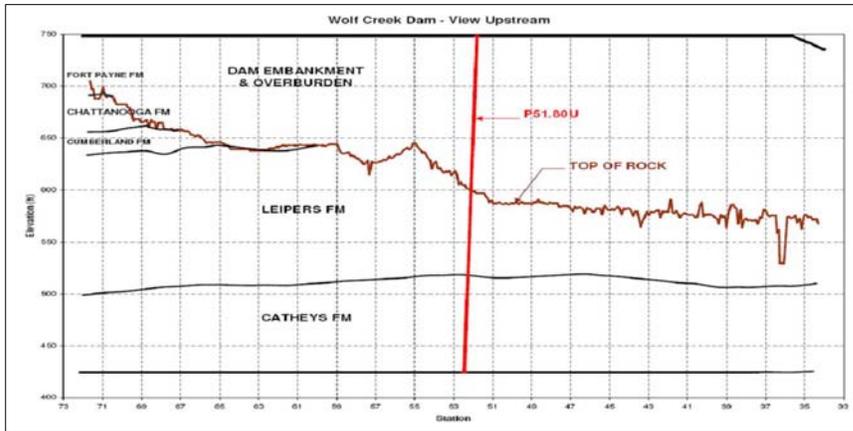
Profile along upstream line of grouting project completed in 2008 at Wolf Creek Dam.
